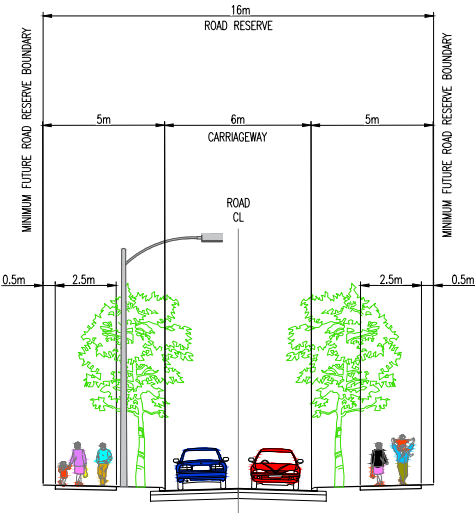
CROSS SECTION OF ACCESS STREETS D
